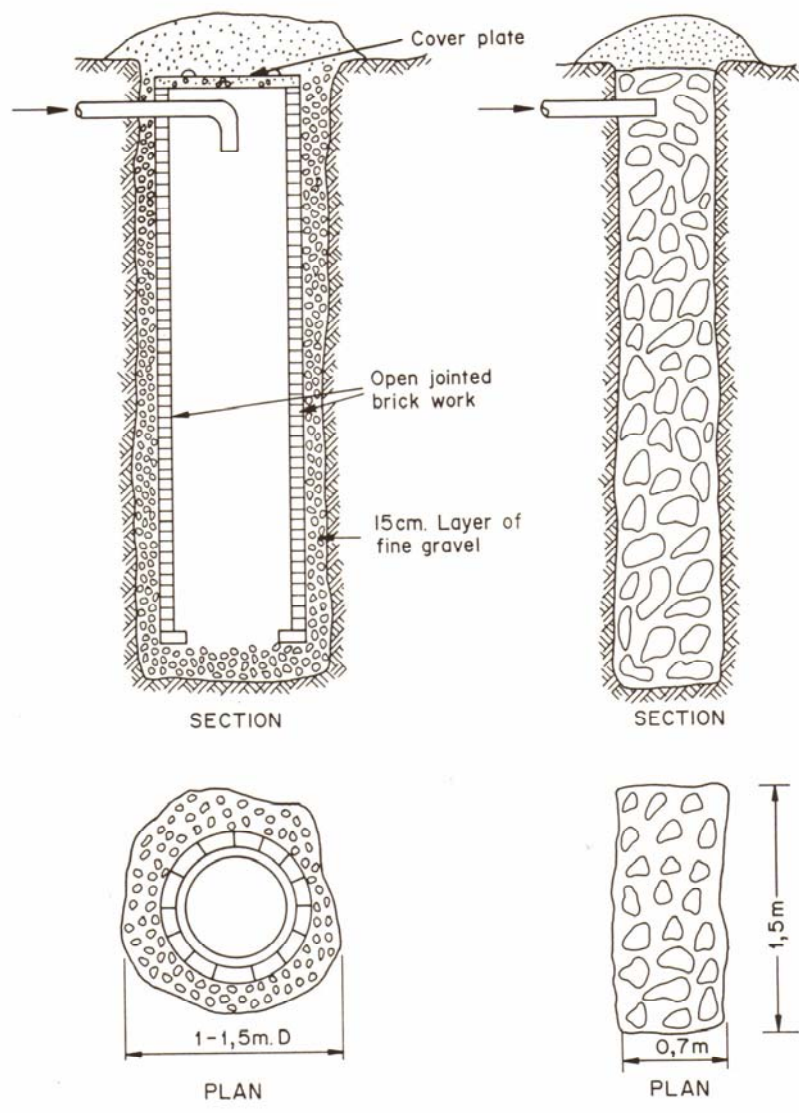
Typical Seepage Pit Construction (source: CSIR Technical Guide K86, 1985).
